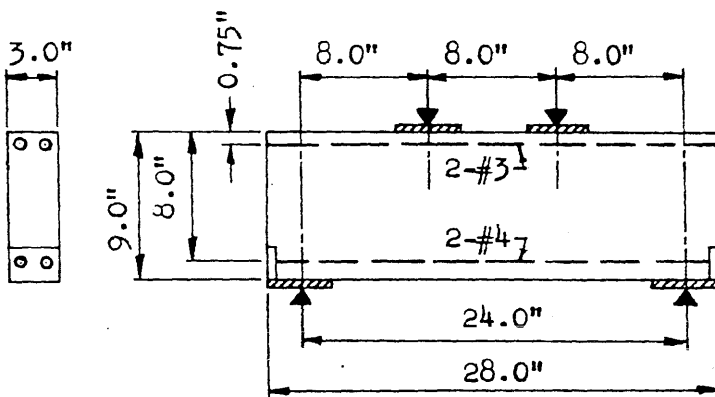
DETAILS AND DIMENSIONS OF TEST SPECIMENS
